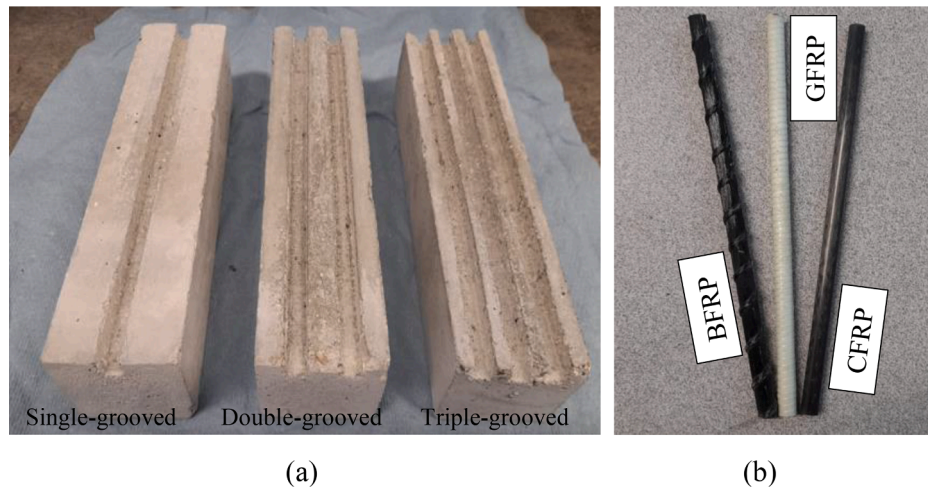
(a) Concrete specimens to be retrofitted and (b) FRP bars used in this study.
